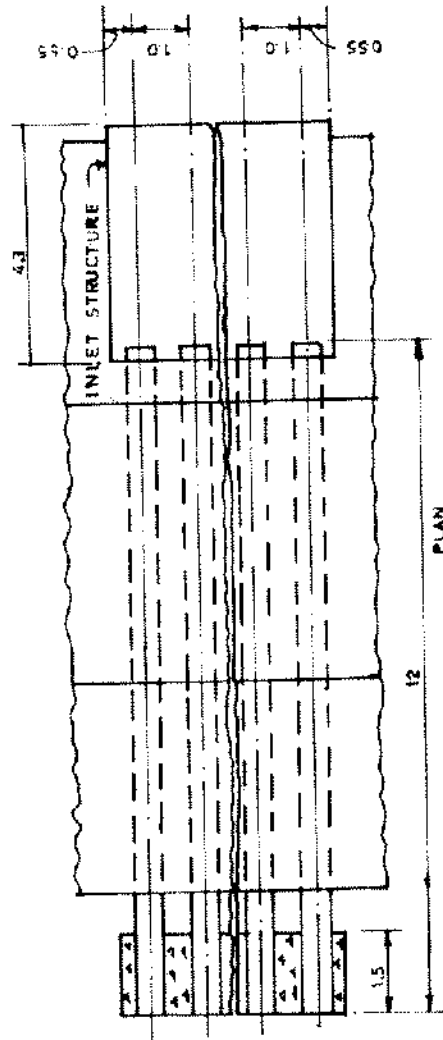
Typical Arrangement of Pipes with Tidal Flap Gates
